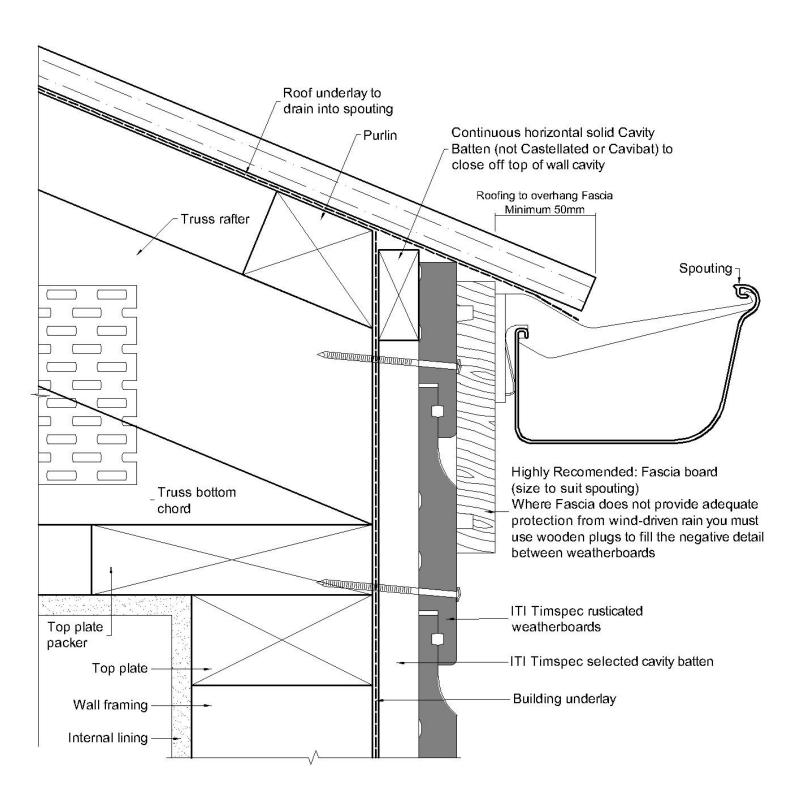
18 RC 602 ROOF/ WALL TOP PLATE - NO SOFFIT
